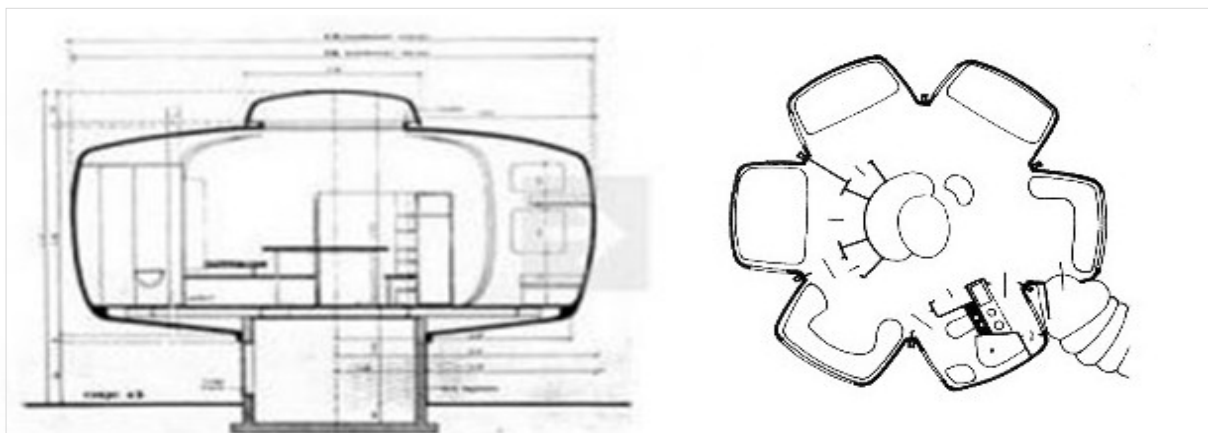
(Left) Section of the shell; Fig. 5.2.1.5. (Right) Layout of a dwelling shell.
